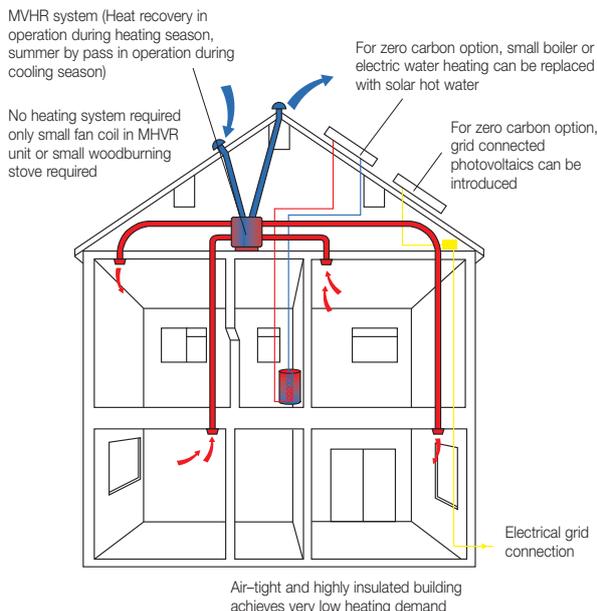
Heating Systems in the *Kingspan TEK® Building System
